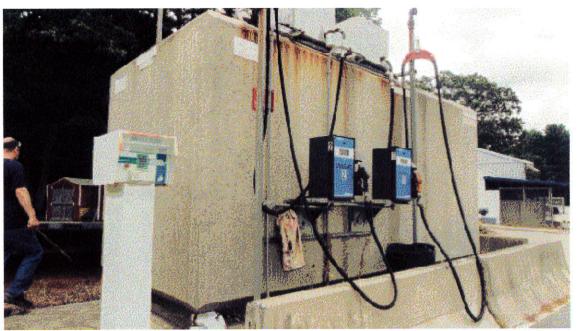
The existing fueling island can be renovated with new dispensers, pumps and fuel management system.
